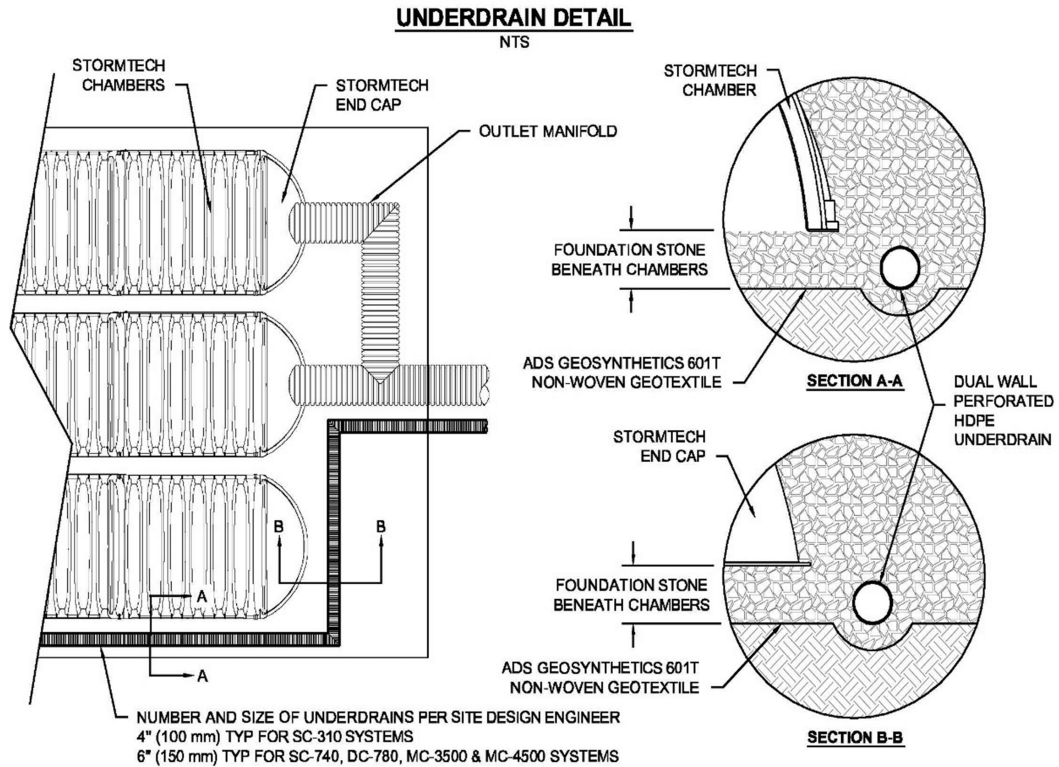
Typical underdrain detail of ADS Stormtech® detention structure
